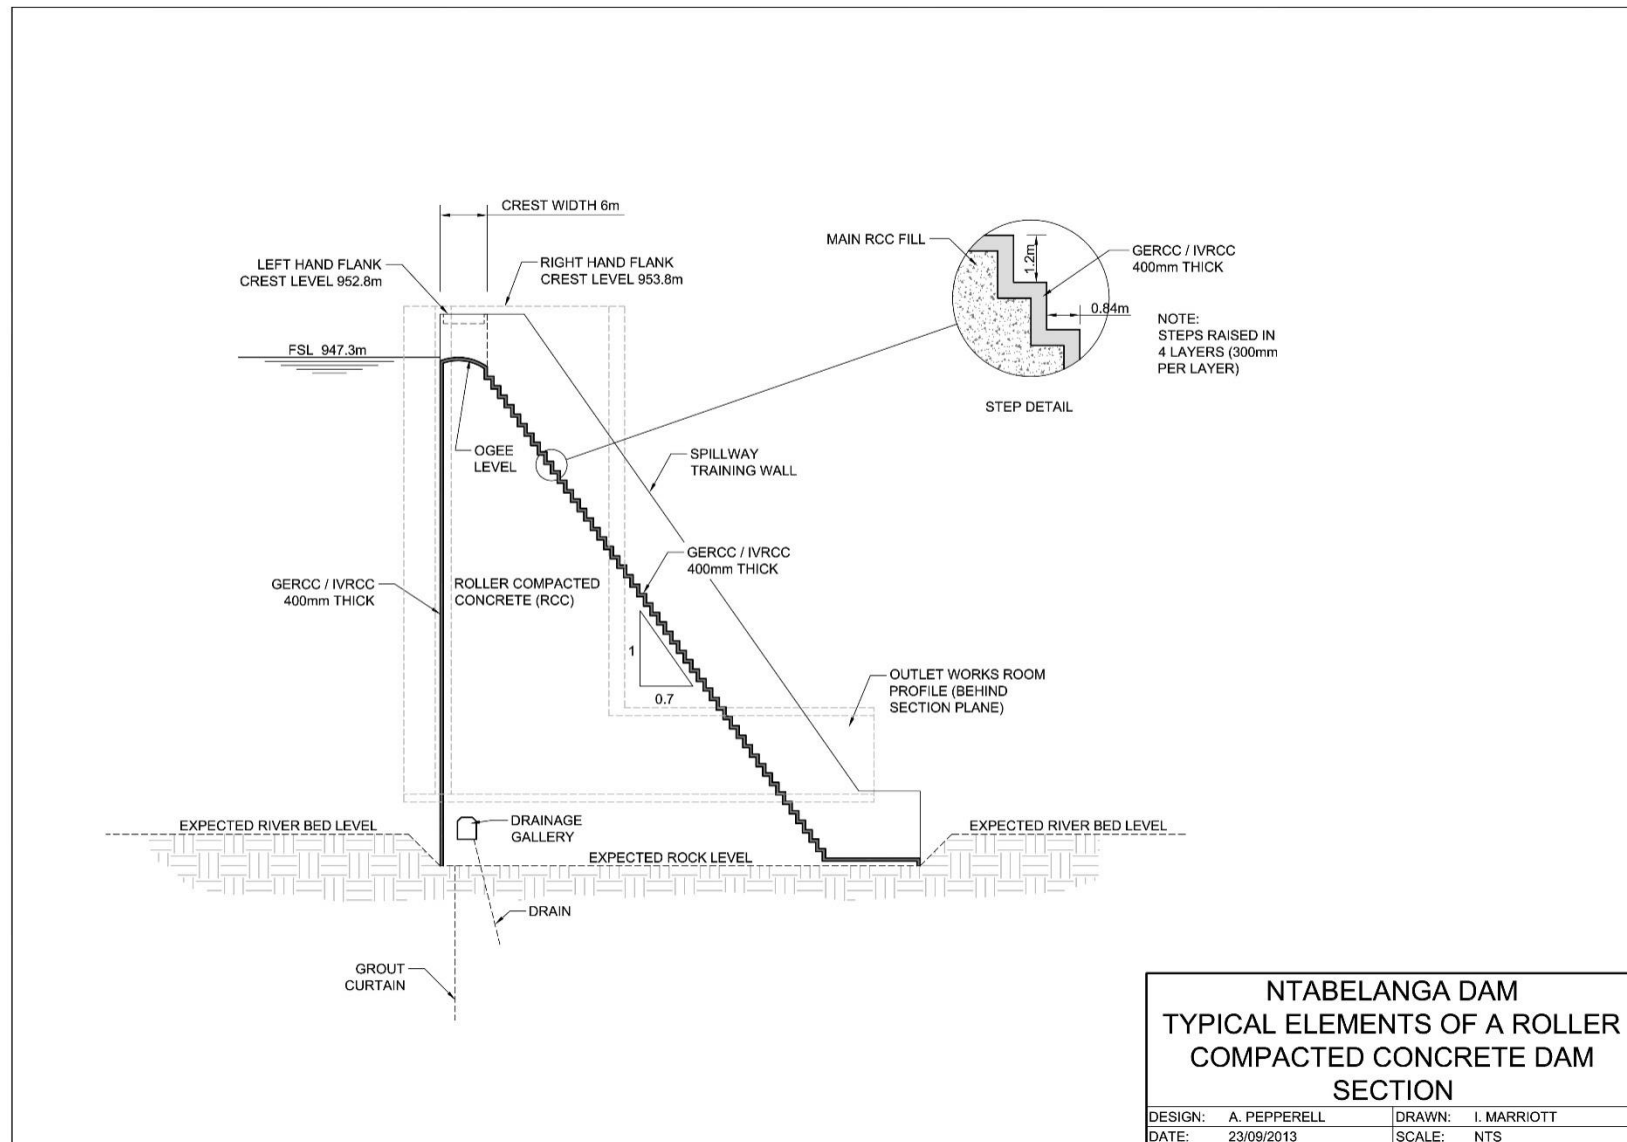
RCC Dam Wall and Spillway Typical Cross Section
